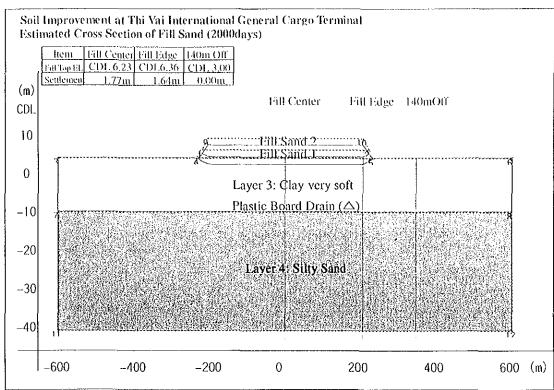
Cross Section of Reclaimed Land and Final Settlement at Thi Vai
